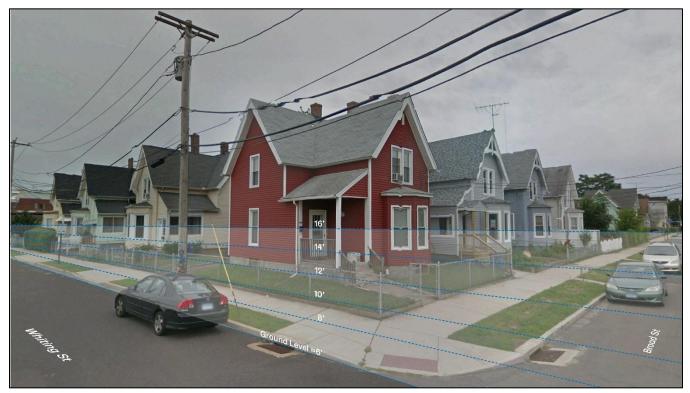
Intersection of Whiting Street and Broad Street with elevation markers for raised street
